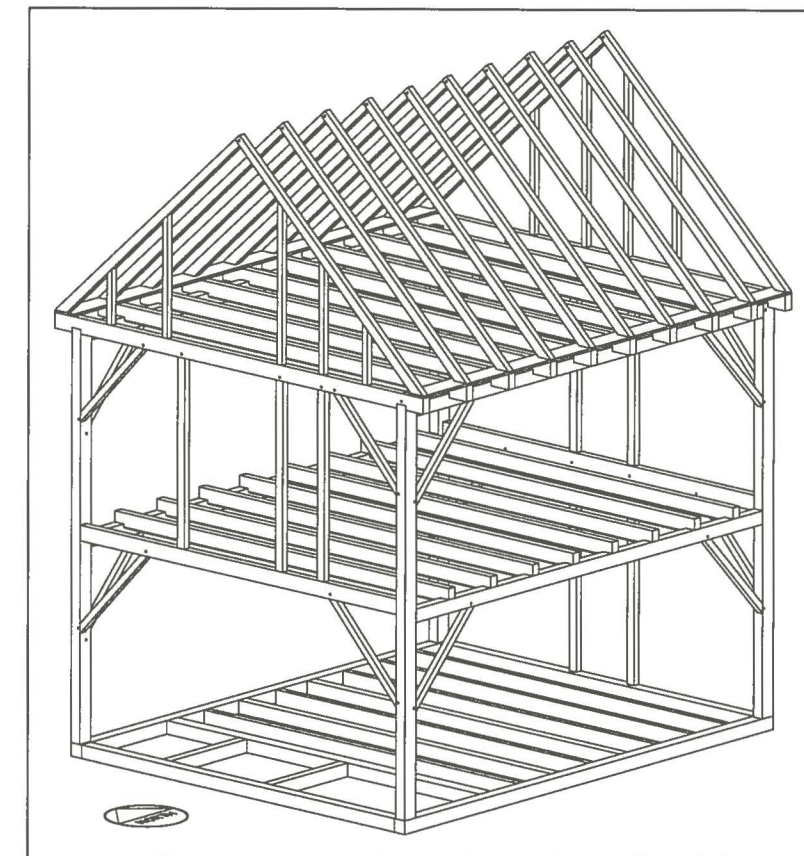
Watson House Period I Frame. A Simplified Anglo-American Box Frame, It is Characterized By Straight Articulated Posts, Up-Braces, False Plate, and Full-Width Floor Joists.
